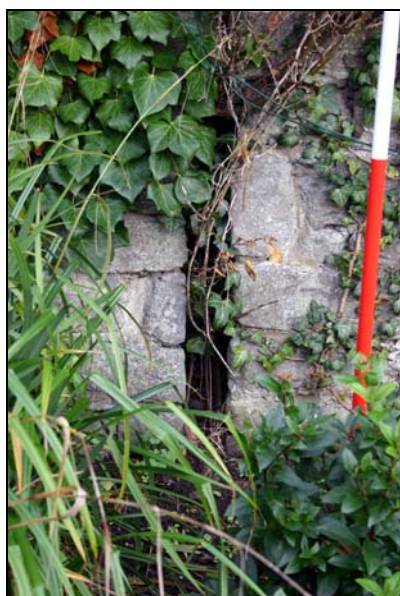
Verdant Place Tower 2 single light, viewed from south
